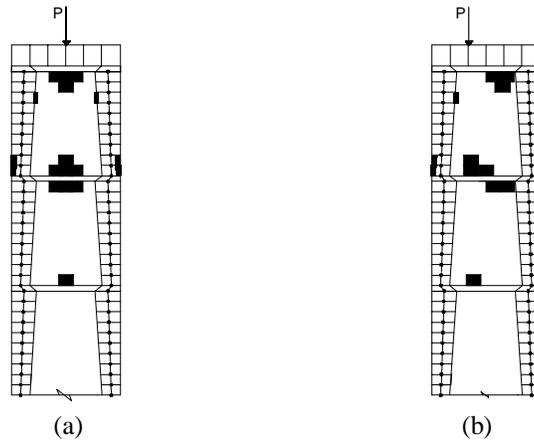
Cracking pattern of plain hollow masonry walls subjected to concentrated load
